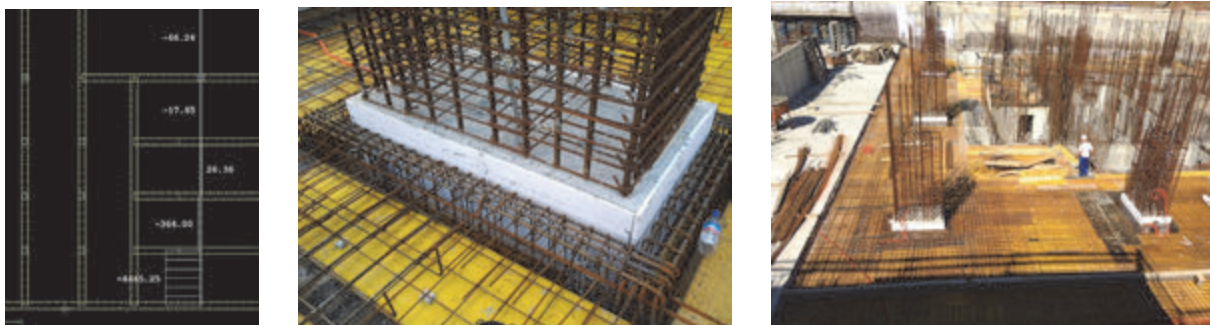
Large shear force in column and separation of basement floor slabs and columns
